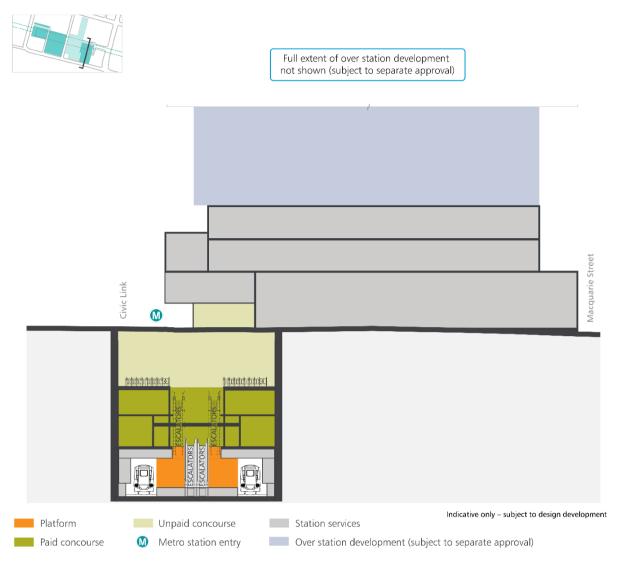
Revised indicative cross-section - Parramatta metro station
